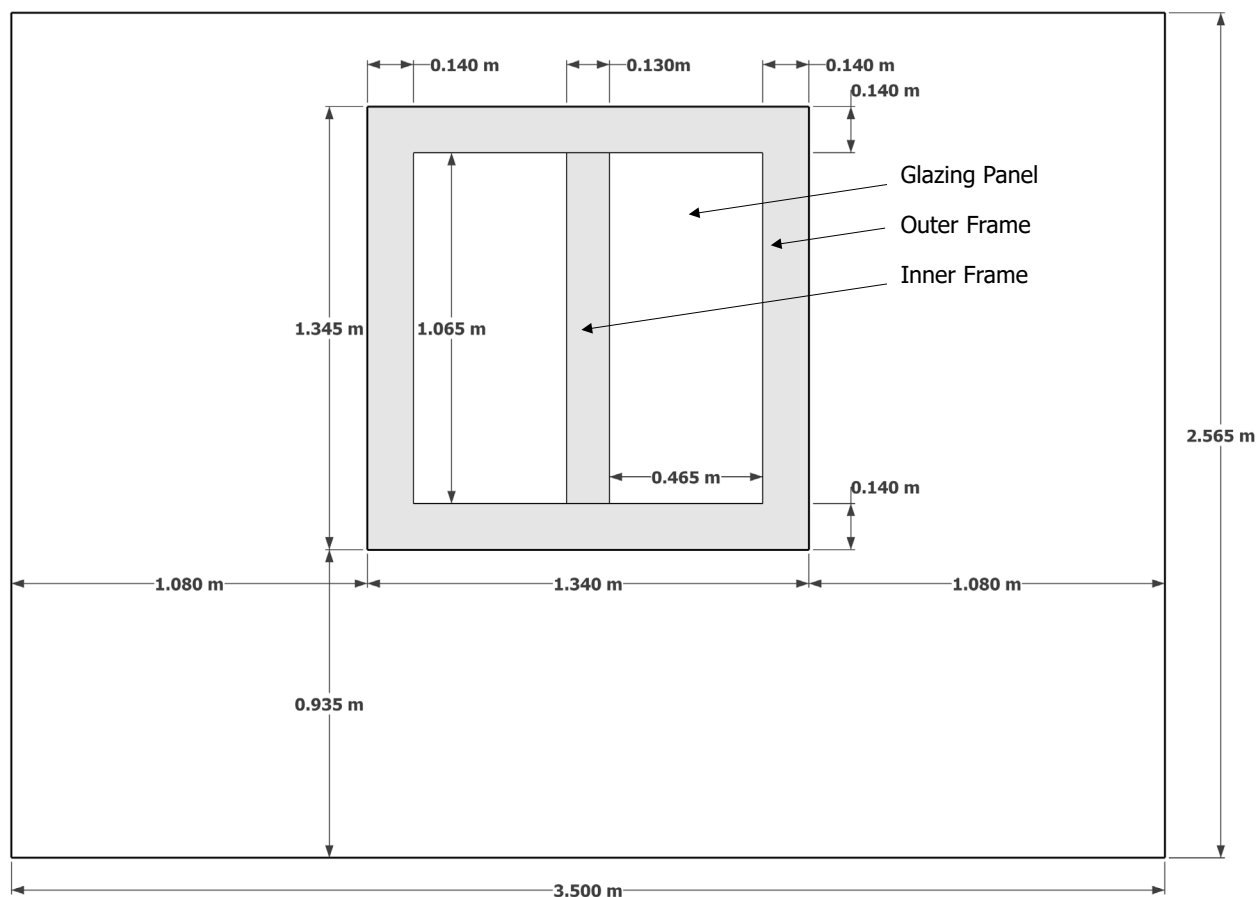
Dimensioned south wall with window elevation, exterior view
